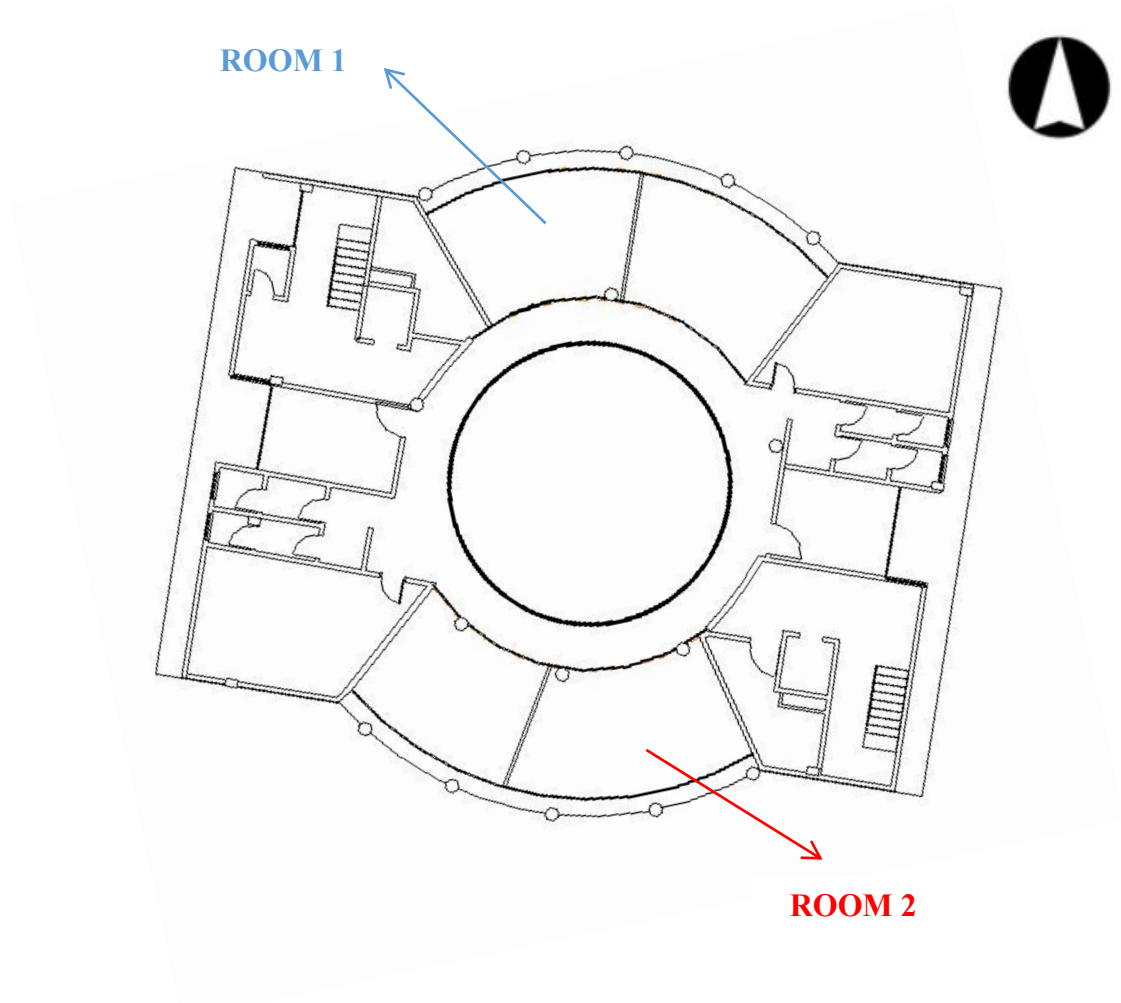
Floor plan of the selected rooms: (Source: Author, 2025)
